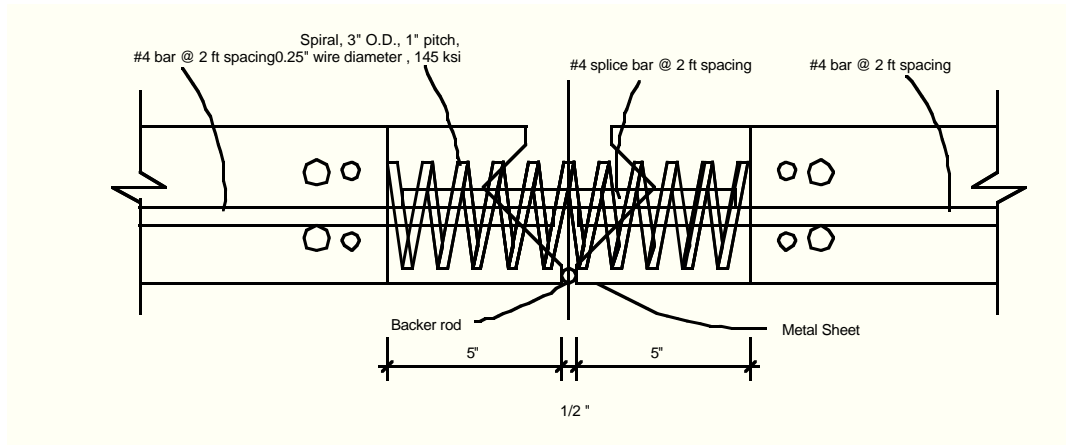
Reinforced pocket detail (1.0 ft = 304.8 mm, 1.0 in. = 25.4 mm).
